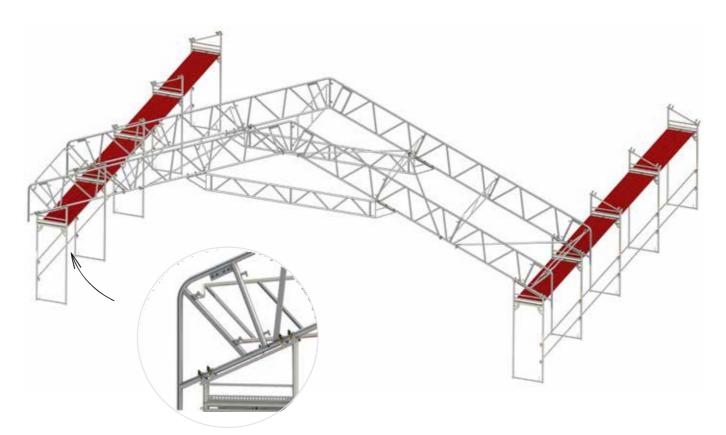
Installation of handrails in the first base bay of the roof slope.
